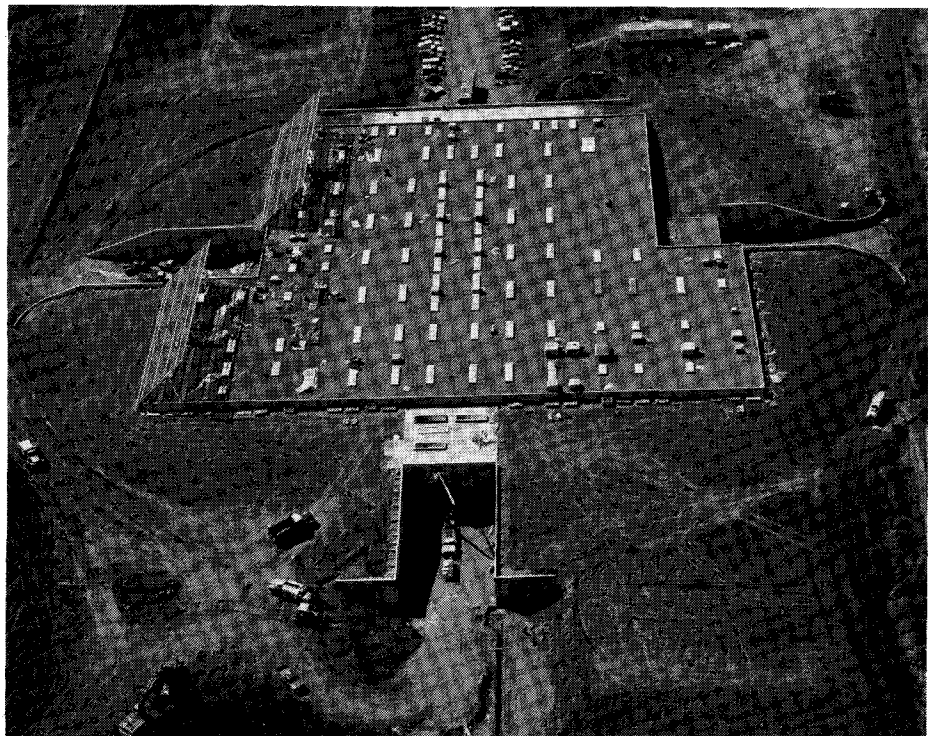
Backfilled structure looking at east entry. Approximately 8000 sq ft (744 m²) of solar collector panels will be used on roof.
